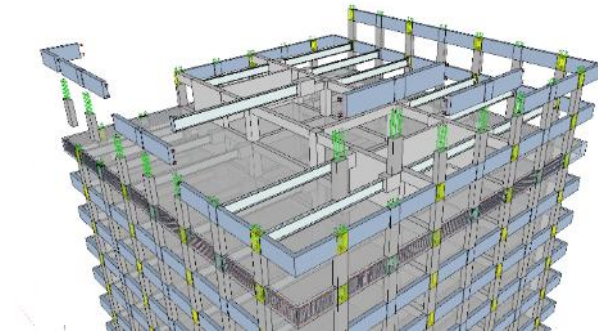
Construction sequence image of RC building applied the innovative precast concrete system for outer frame (Courtesy by TAKENAKA corporation)
